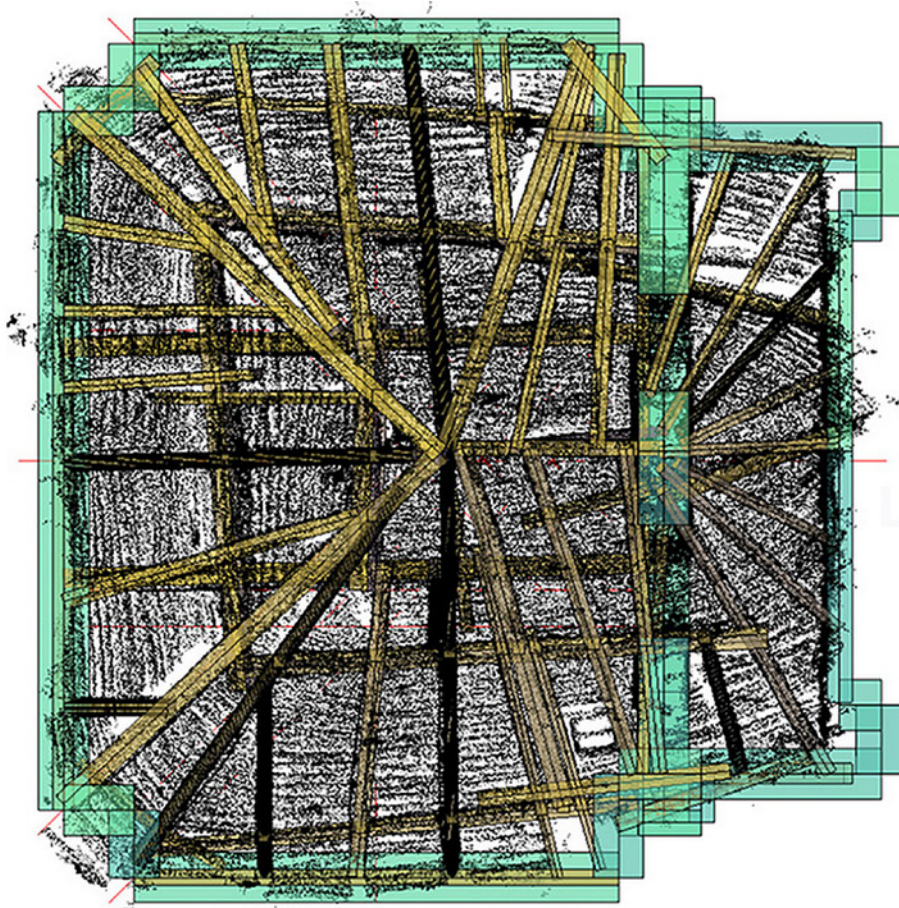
Arrangement of the minor rafters in the "hut" roof schema.
